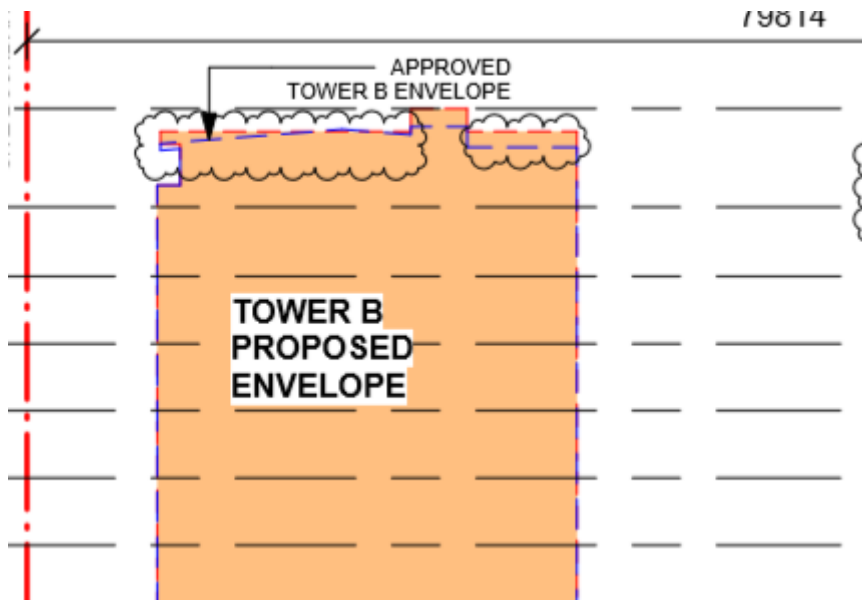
Proposed changes to the Tower B approved building envelope – Section A (Base source: Billard Leece Partnership)
